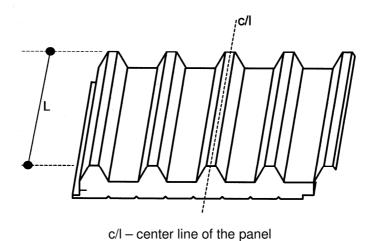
Length (measurement on a roof panel, on the center rib)
